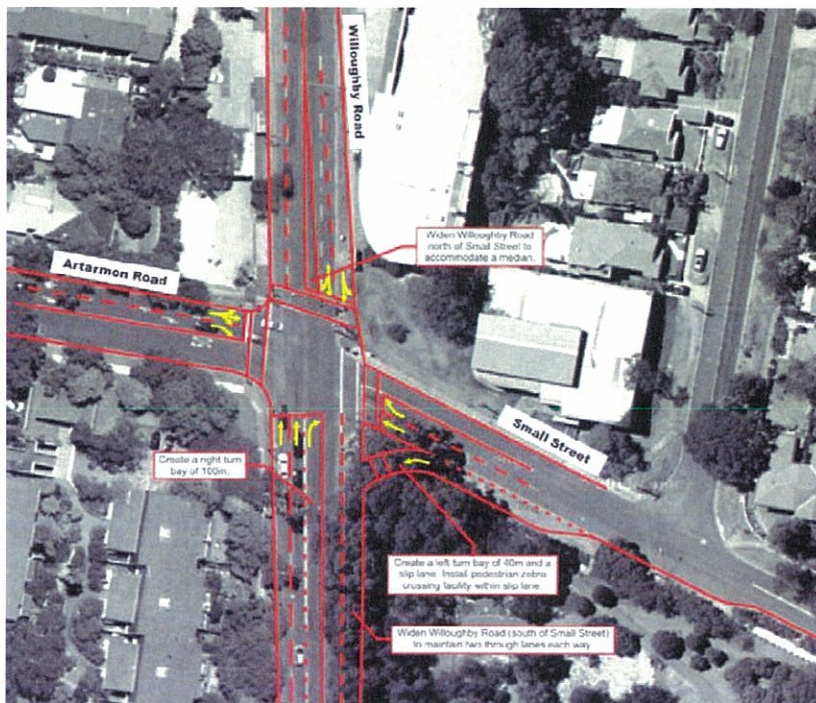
Proposed Willoughby Road / Artarmon Road Intersection Upgrade
